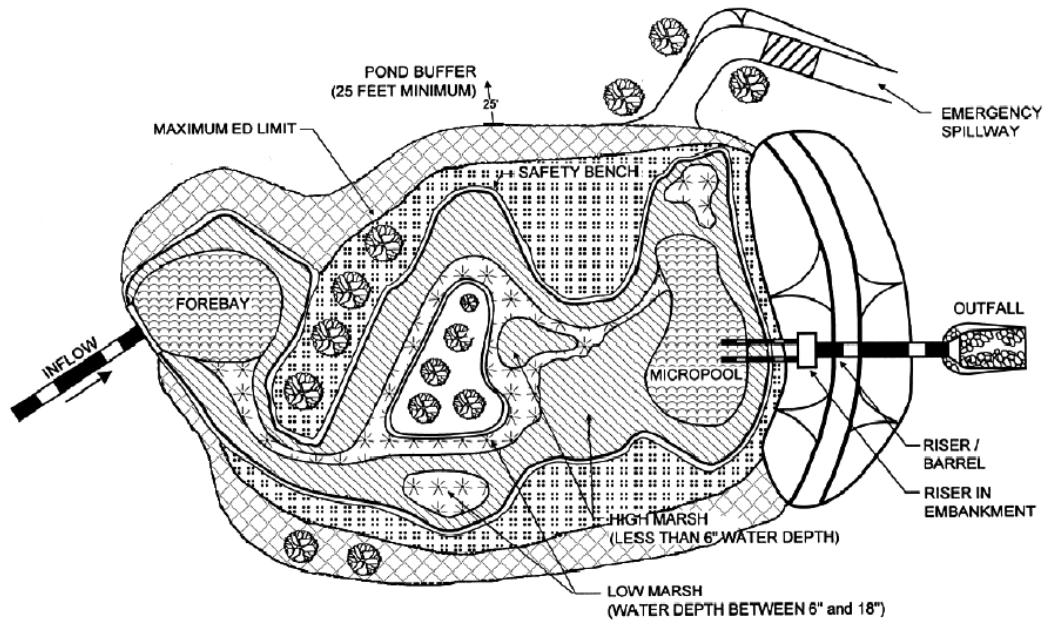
Plan View of Hydrologic Zones around Stormwater ED Shallow Wetland
